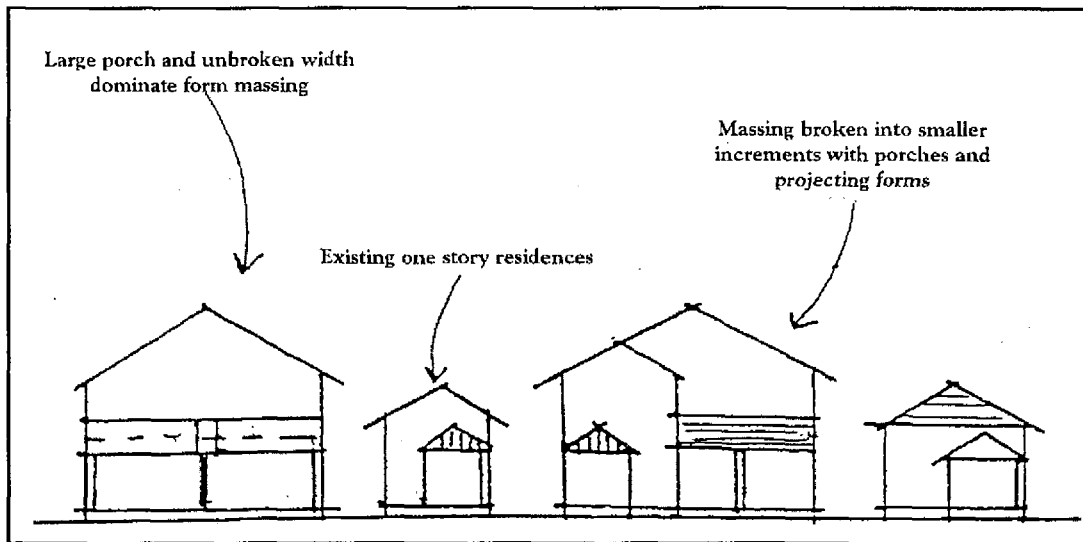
Create visual linkages. Offset building walls and roof lines. Incorporate similar roof forms and smaller design elements. (Note: The intent of this drawing is not to indicate that full-length porches are not acceptable for multi-family dwellings, but that design features must be considered along with overall form and massing to achieve compleatability.)
